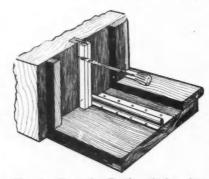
How the Parting Strips Are Fastened with a No. 6 Flat Head Screw,
